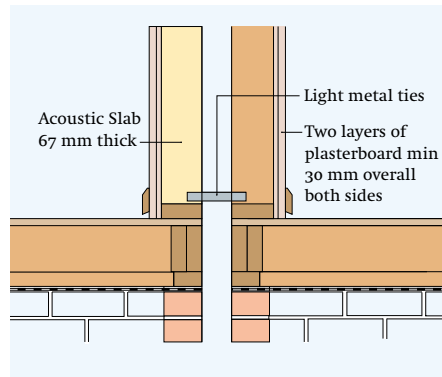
Acoustic Slab as acoustic insulation to timber framed separating wall
